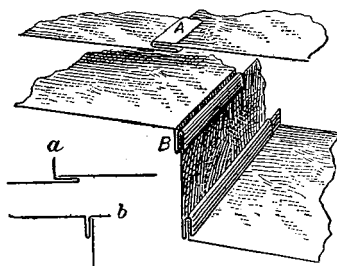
Connection Between Cold or Warm Air Duct and Casing
